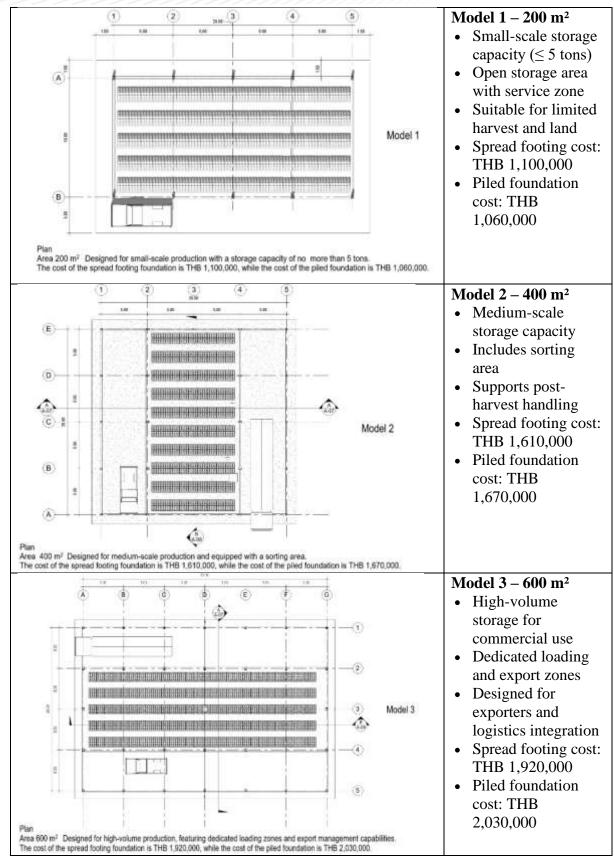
Floor Plans and Comparative Features of the Three Small-Scale Durian Storage Building Models
